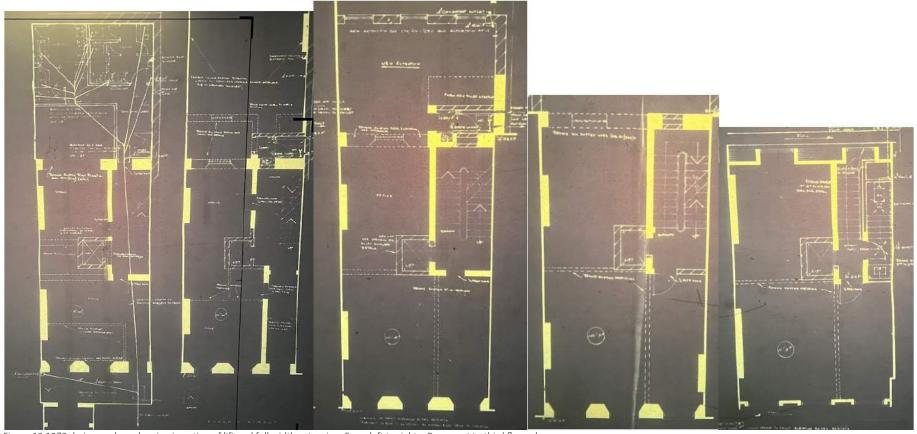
1972 drainage plans showing insertion of lift and full width extension. From left to right – Basement to third floor plans.
